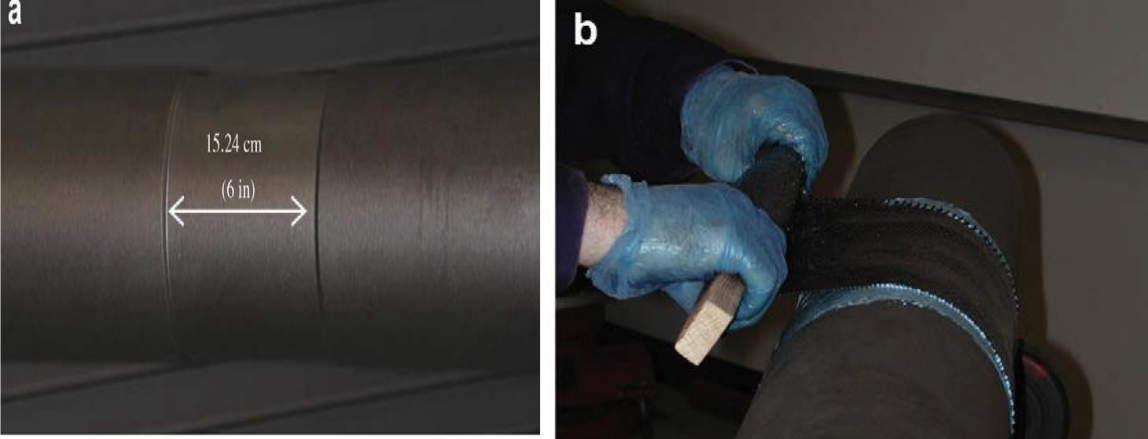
Pipe test vessels with machined flaws with a depth of 50% wall thickness for (a) and (b) Pipe repair process filling defect with putty[114].
